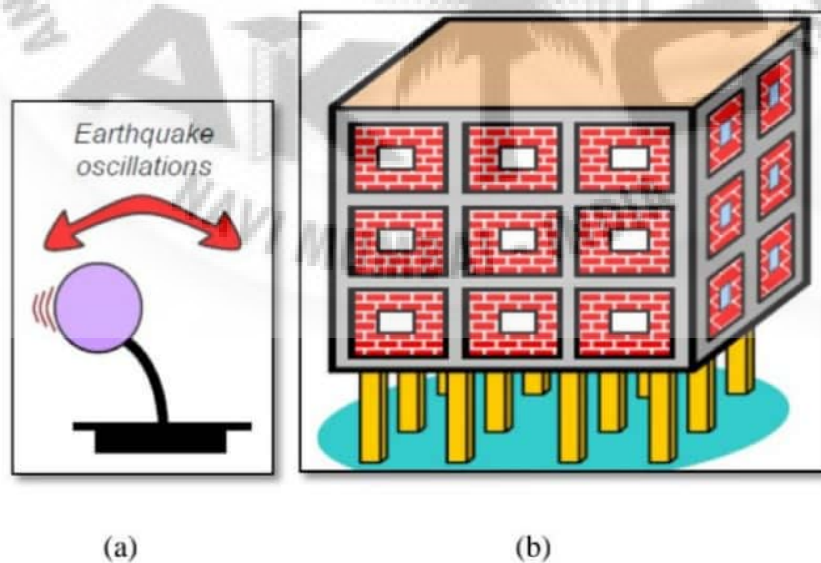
Structural Idealization of Open Ground Storey as an Inverted Pendulum
